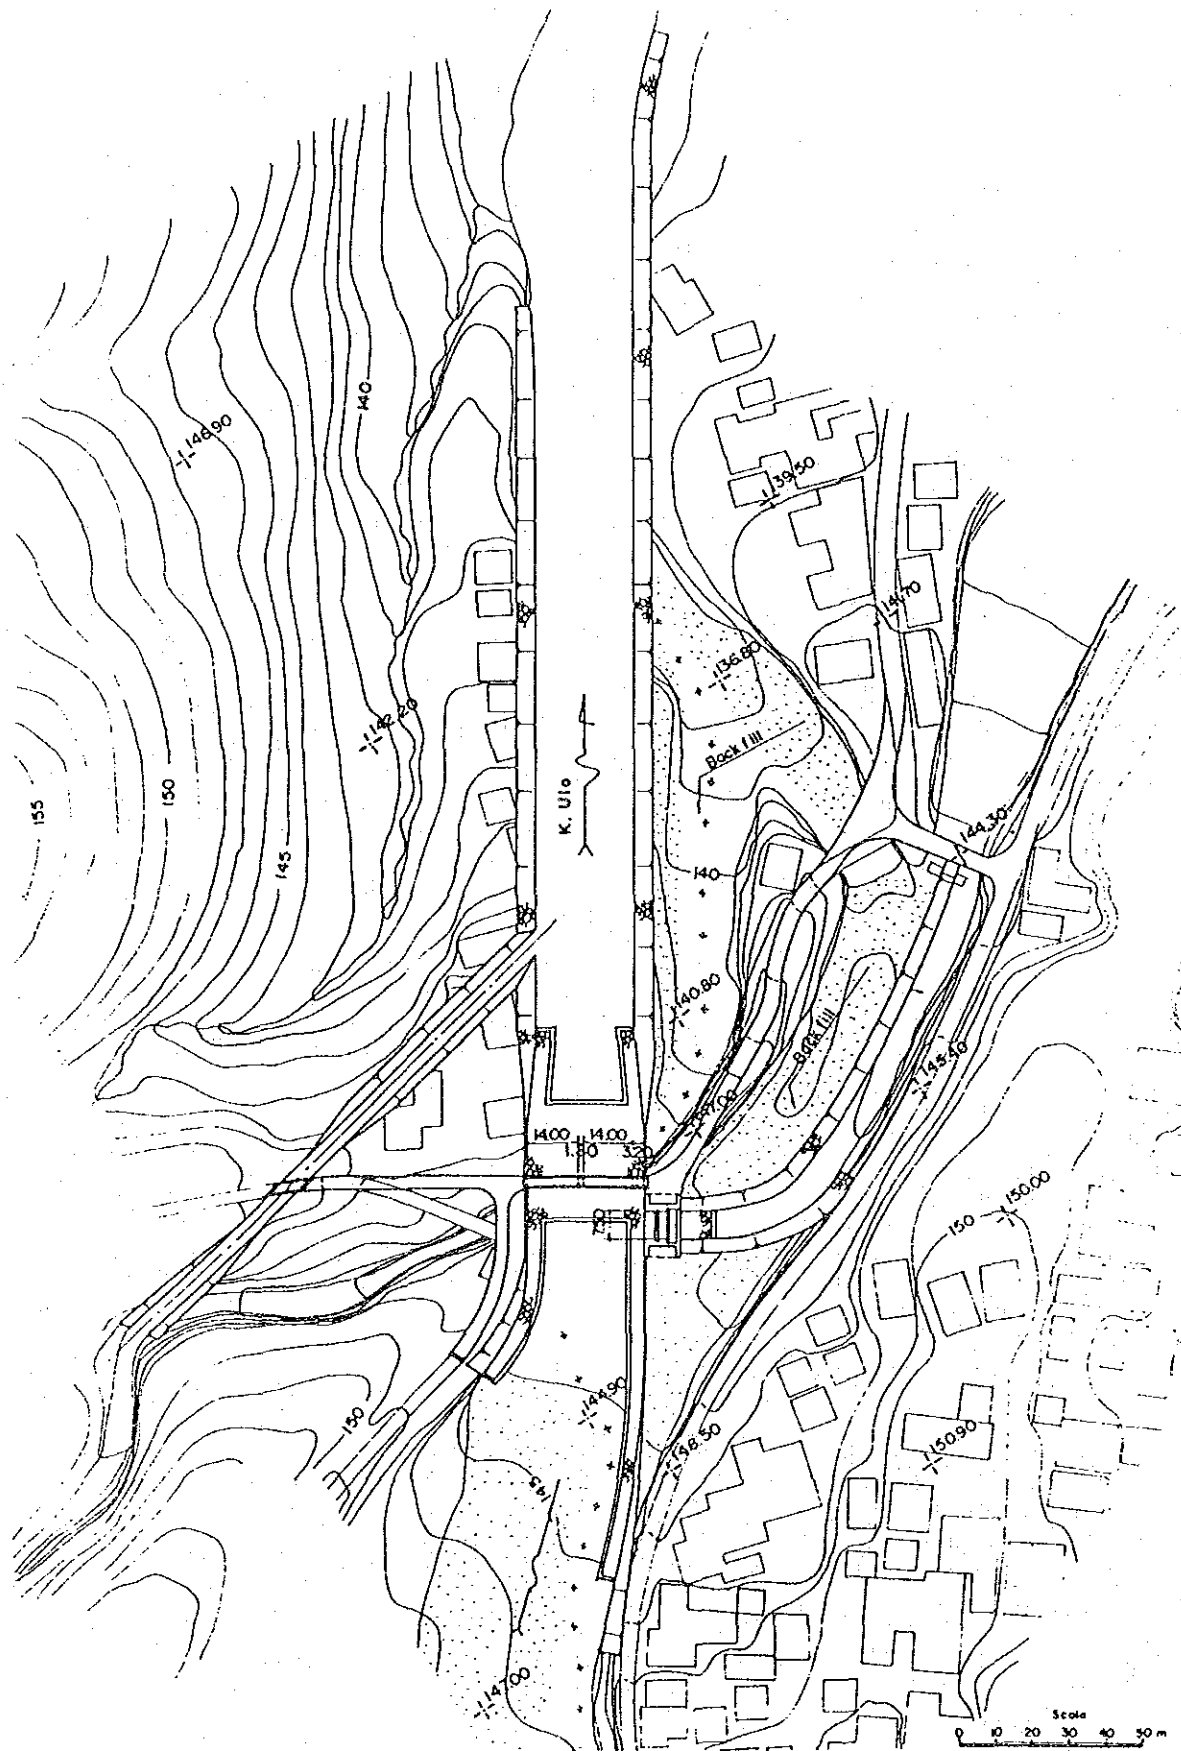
PROPOSED DIVERSION WEIR AT UPPER ULO (1/2)
